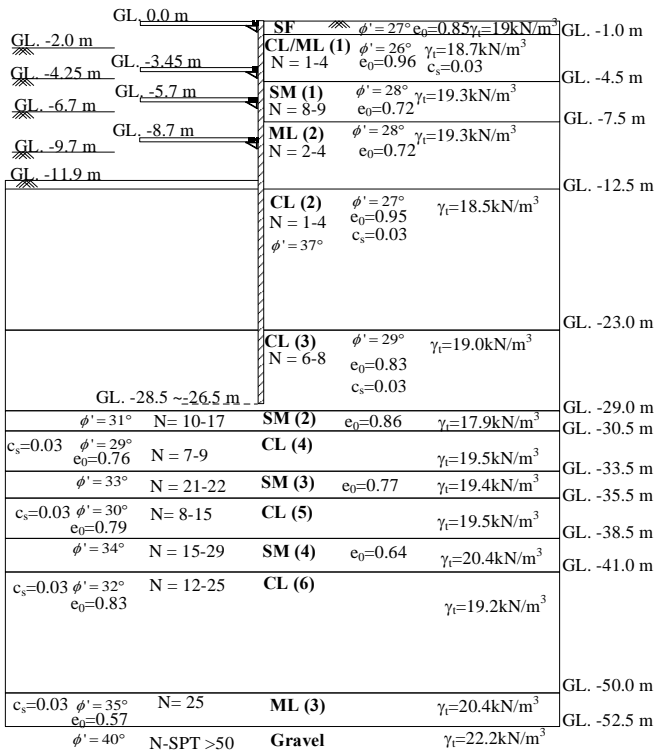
Profile of the excavation sequence and subsurface soil layers for Case 1
